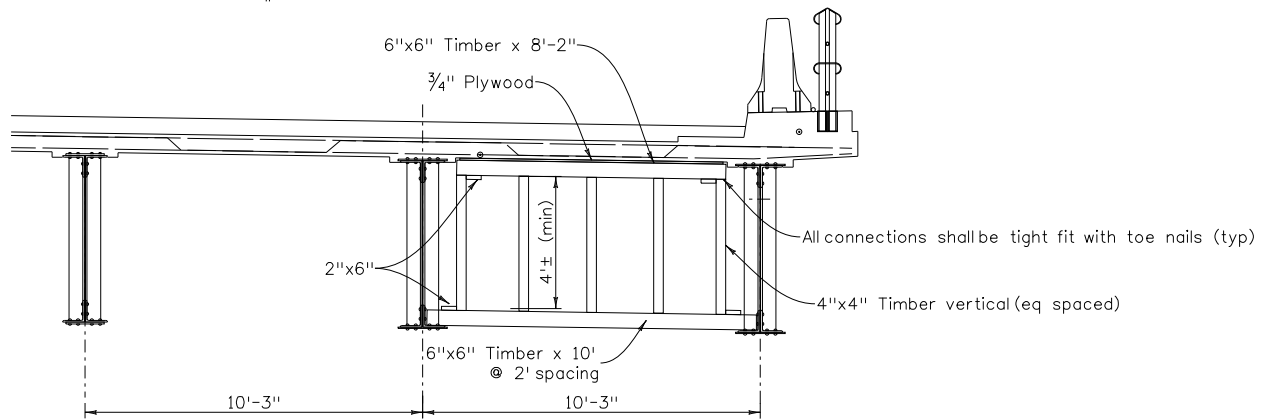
(I)-1 Sample Section of Falsework to support a deckFig. 16.12(I)-2 Photo of Deck Falsework
